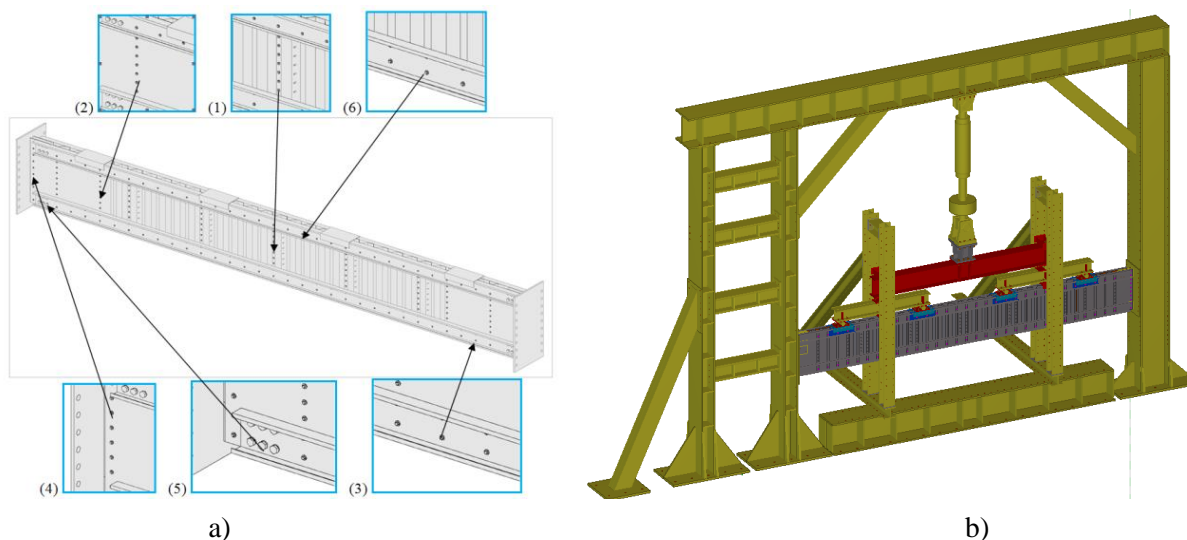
a) Type and position of the connections used for the spot-welded beams, b) Test setup.
